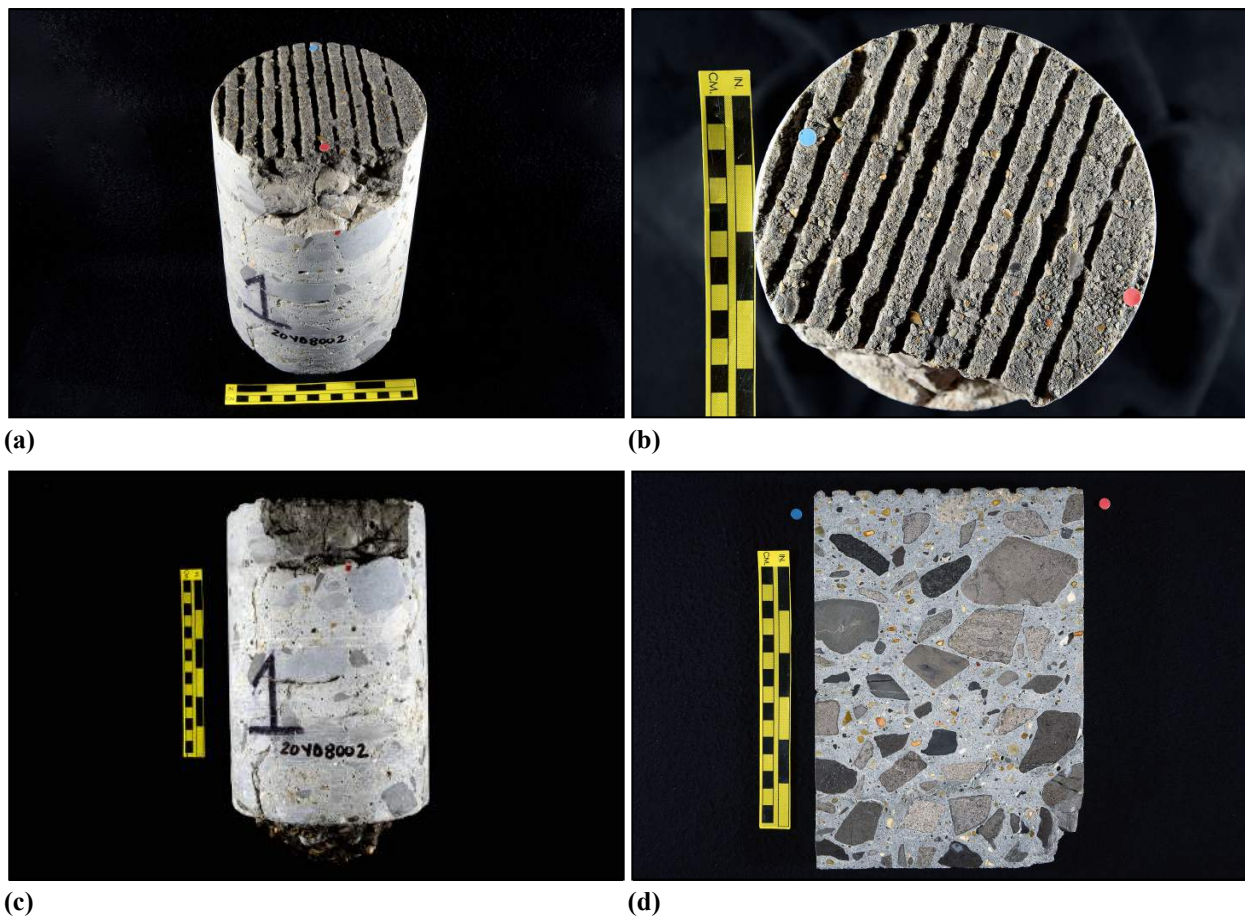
Photographs of Core 1. (a) Oblique view of the top and side of the core. (b) View of the top surface of the core. (c) View of the side of the core; note spalled area. (d) View of the polished surface of the core. Note that both sides of the core were polished. The yellow scale bar is ~ 150 mm (6 in.) long.
